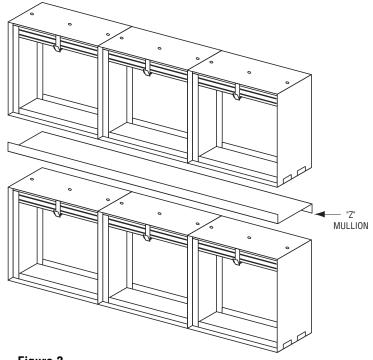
3 hr. label vertical installation multiple section (see note 8).
